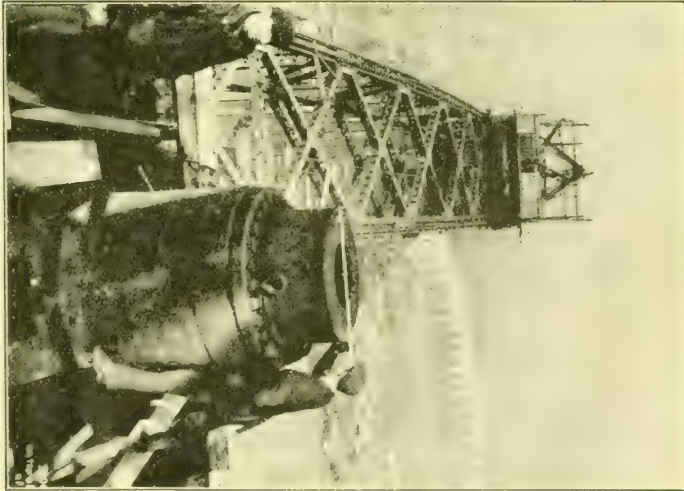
3 000-TON HYDRAULIC JACK,
